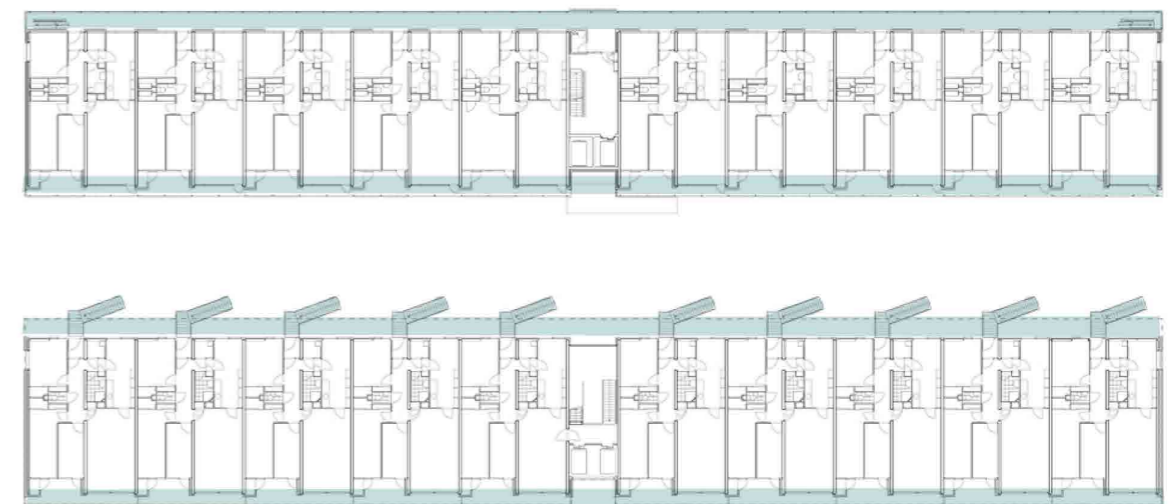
Previous and current ground floor plan. As can be seen, on the northern side platform is removed to improve feeling of the security. ⁽⁸⁾
